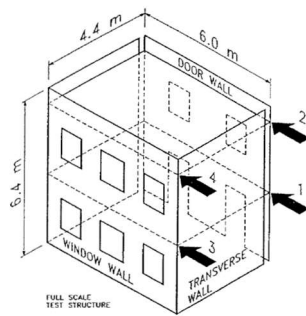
Pavia house building prototype (Magenes et al., 1995)
